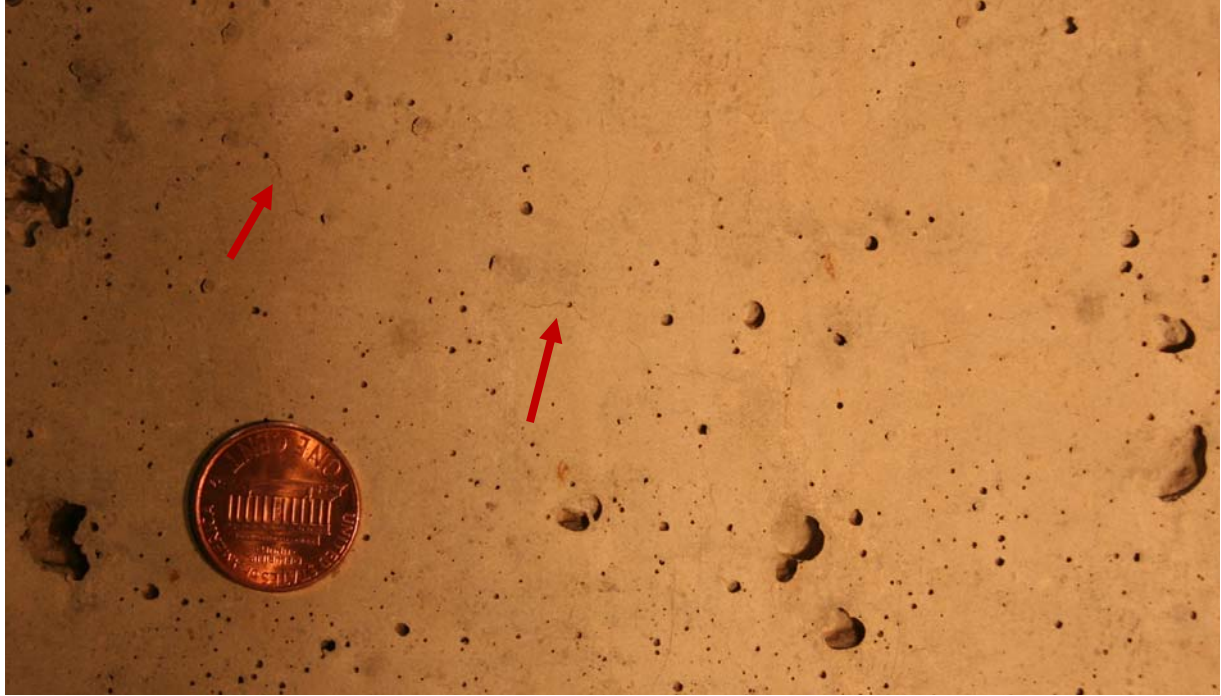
Photo. Surface finish and shrinkage cracks on formed side of precast concrete deck panel.
